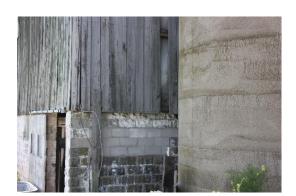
Poured-in-place concrete silo on northeast façade, looking southwest
